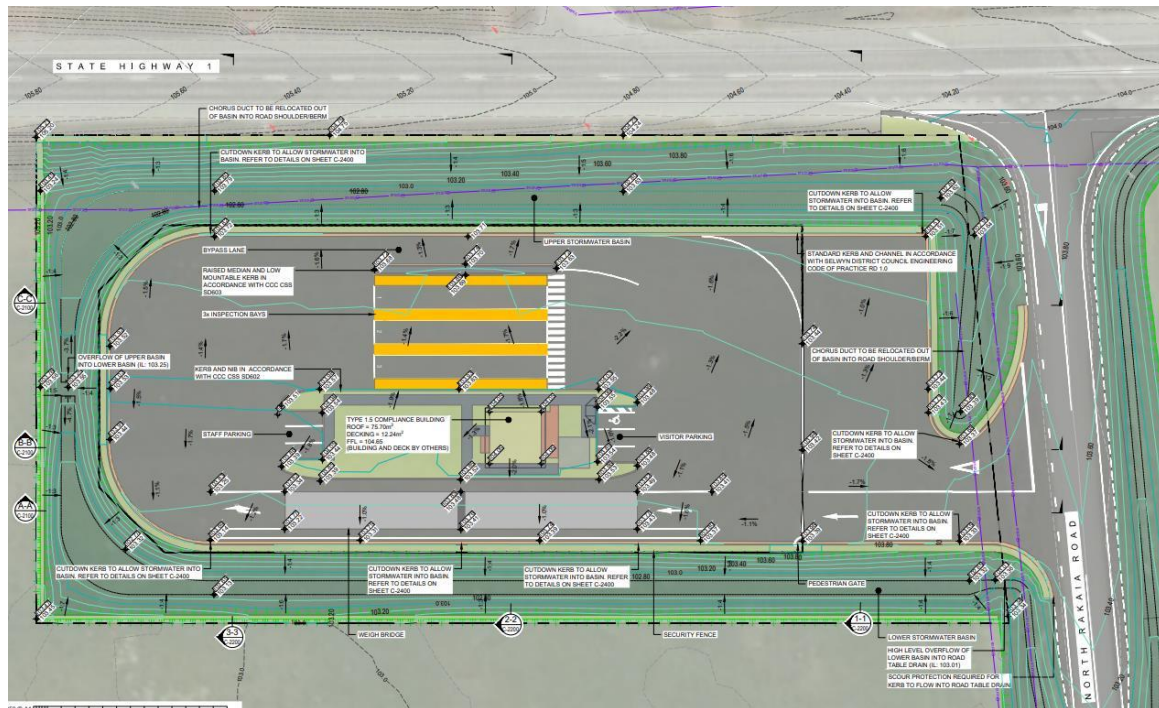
Proposed general layout of the CVSC to be located in Designation TR7. (Source: WSP)
